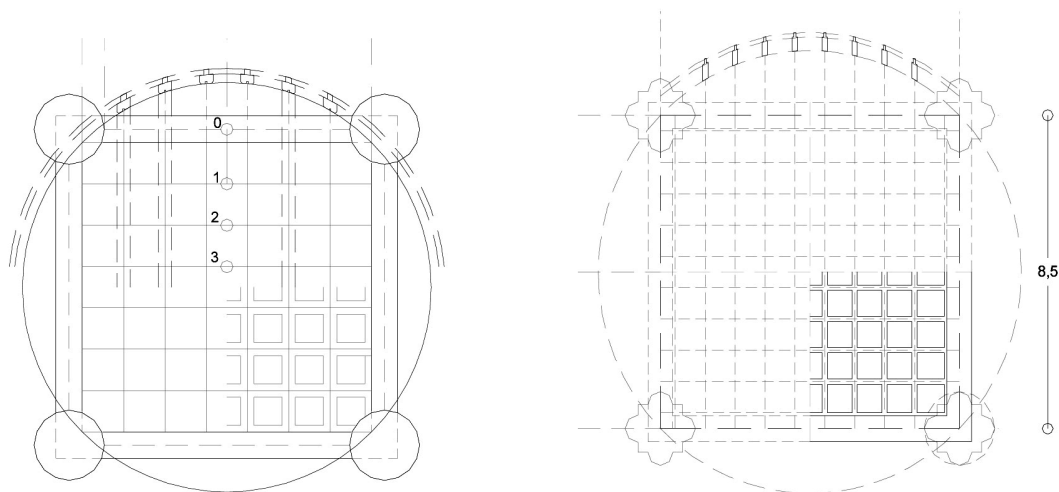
Detail of Mexican's vault plan and Spanish's vault plan
